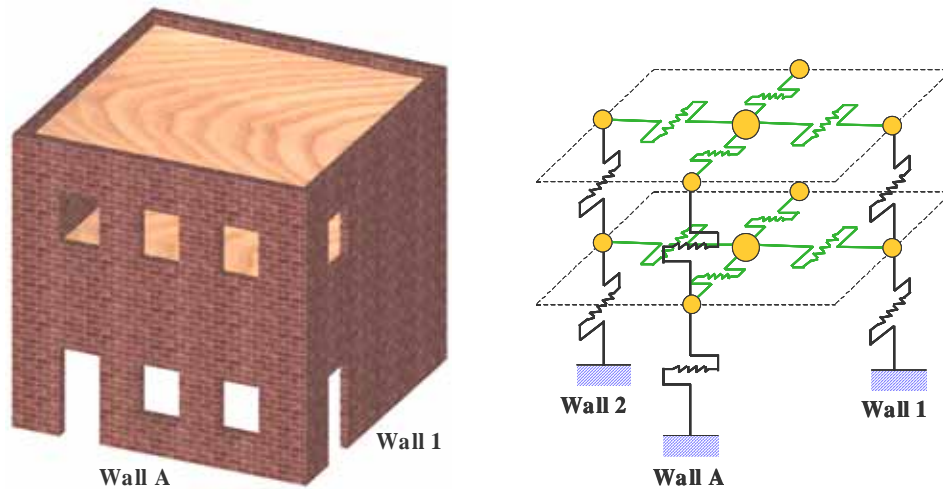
DRAIN-2DX Composite Spring Model for the ST-11 URM Building
